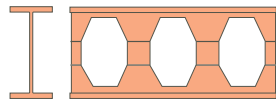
Cutting rolled sections for the manufacturing of ACB beams
